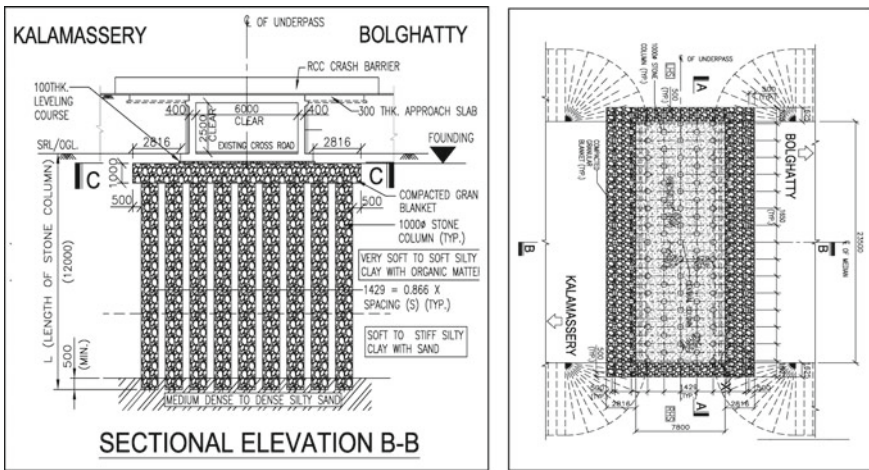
Typical elevation and plan showing arrangement of stone columns and granular blanket below RCC box underpass
